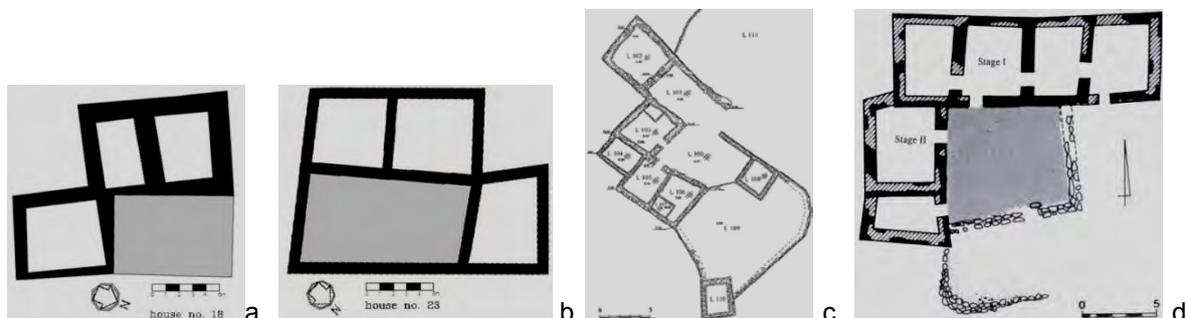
(a) plan of house no. (18) at al-Hallabat,(b) plan of house no. (23) at al-Hallabat, (c) plan of Nahal Mitnan the farmhouse (After Haiman, 1995, plan 3), (d) plan of farmhouse at Nahal ha-Ro'a (Source: After Hirschfeld, 1995: 39, Fig. 15).
